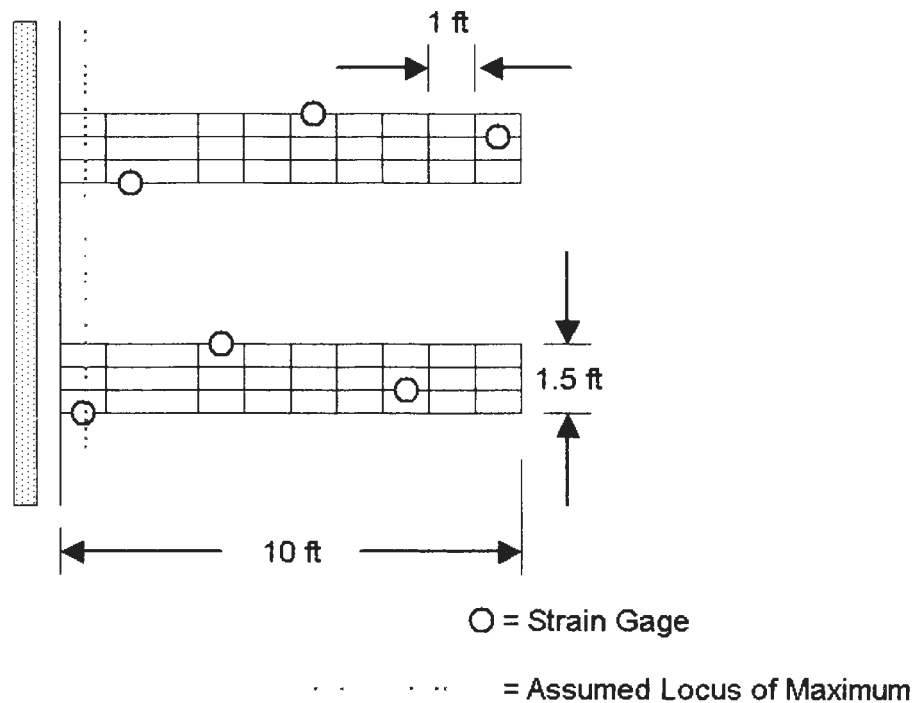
Plan view of instrumented intermediate bar mats 1.5 ft from base of wall
